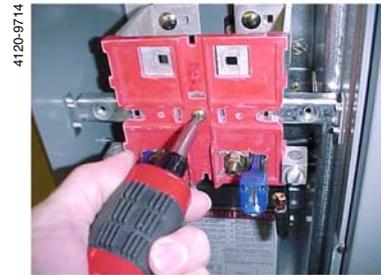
Meter Socket Assembly and Mounting Screw / Ensamble de la base de medición y tornillo de montaje
